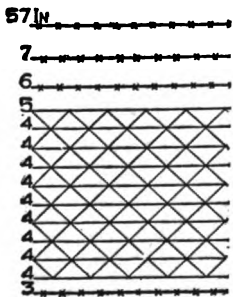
A dog-proof fence. The bottom strand (of barbed wire) should run close against the ground.
